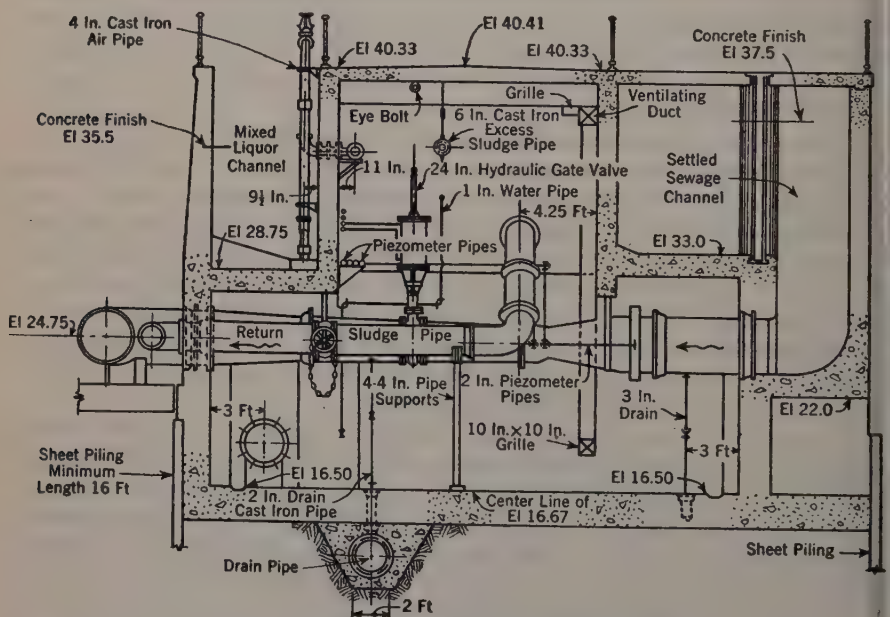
CROSS SECTION OF PIPE GALLERY, ACTIVATED-SLUDGE PLANT
